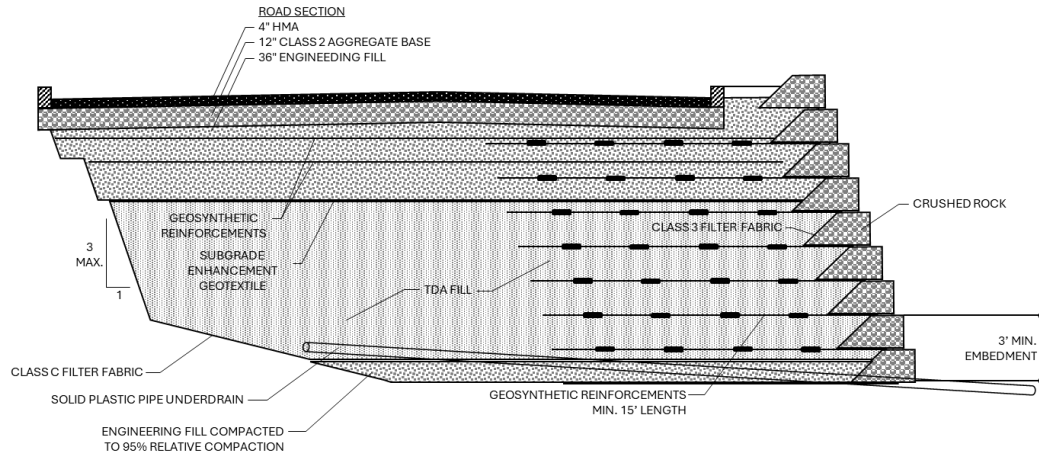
Typical cross-section of wall (redrawn from McCartney 2021).
